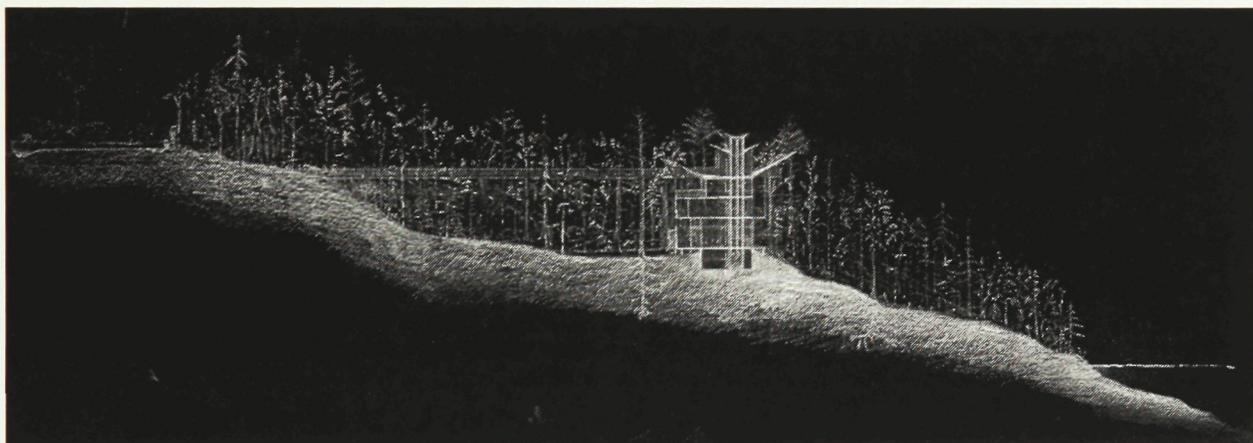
Initial longitudinal site section placing tree house and entry/bridge.
